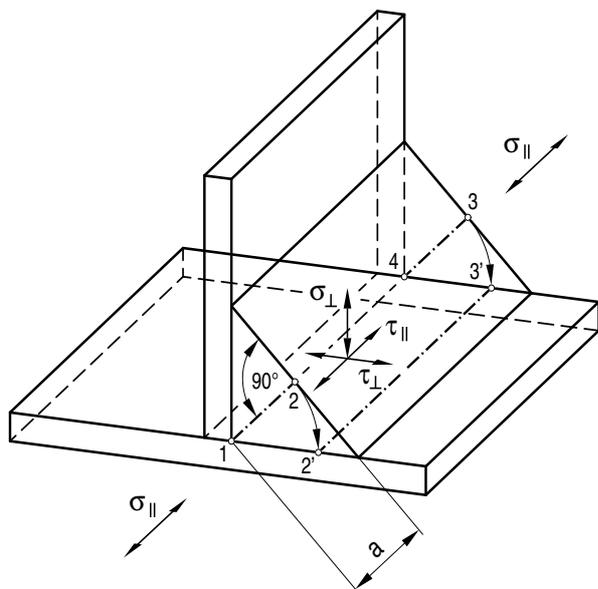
Possible directions of stresses in the fillet weld
